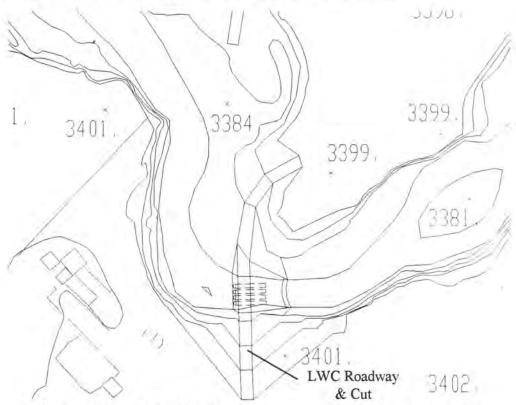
Low Water Crossing, road cut, and surrounding topography.
